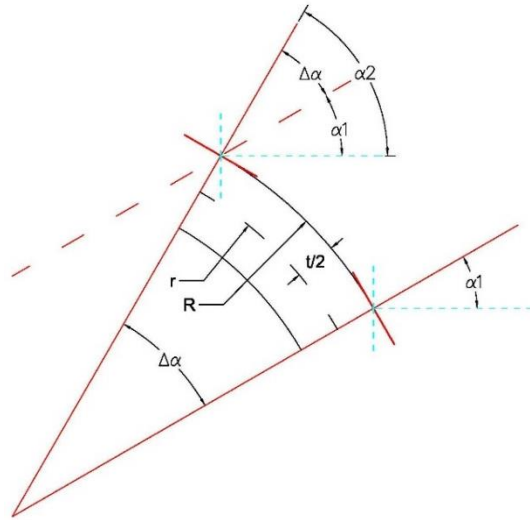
Calculate approximated girder web stresses from girder web rotation
